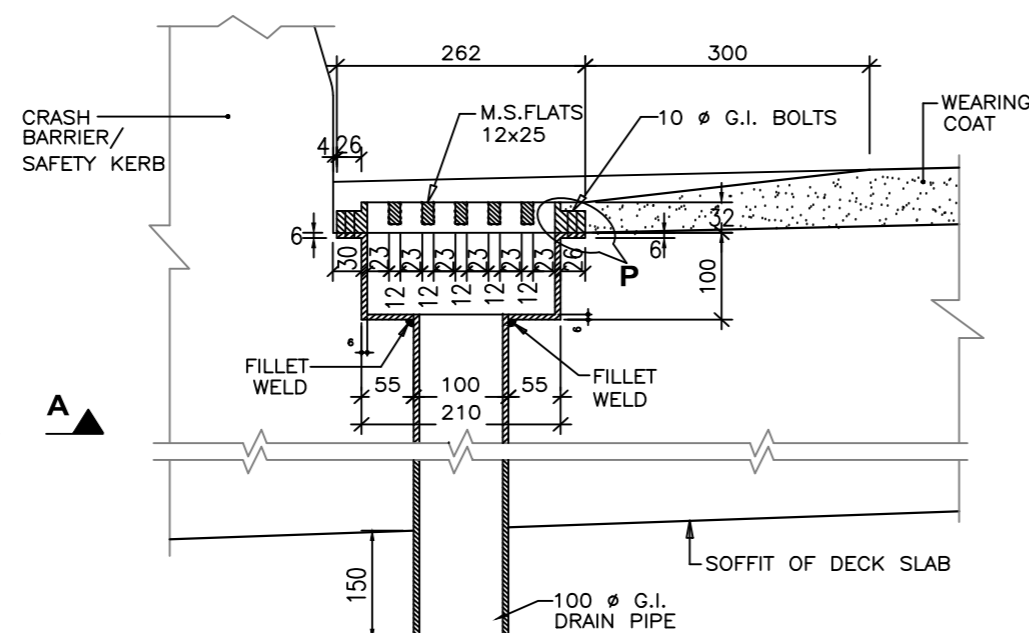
DETAILS OF DRAINAGE SPOUT AND COLLECTION PIT
